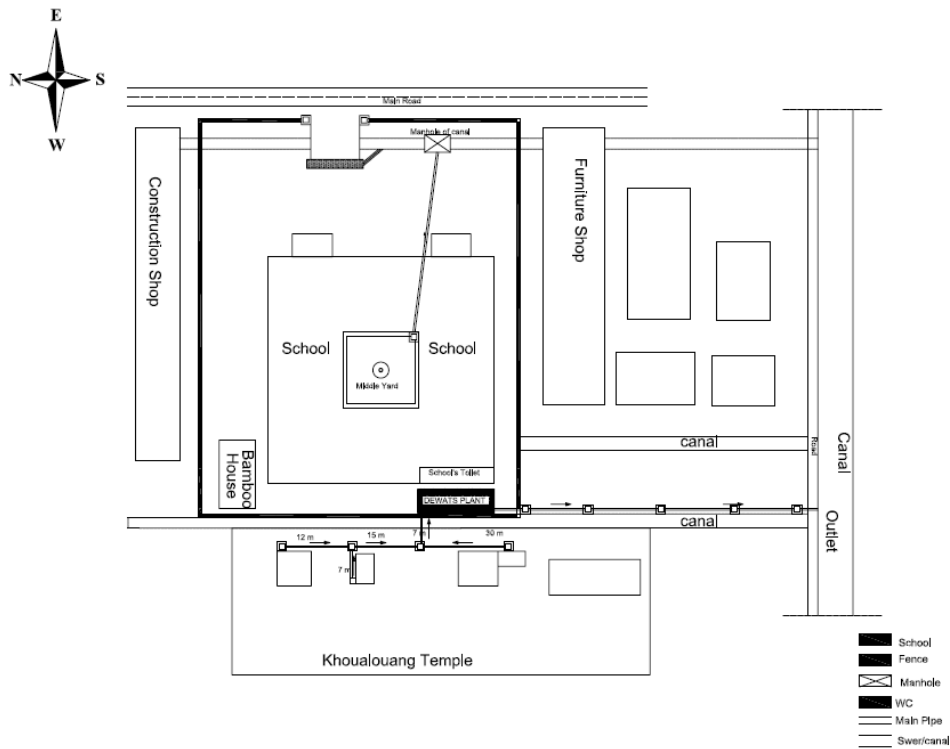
Layout of SBS Sewer Network Plan
